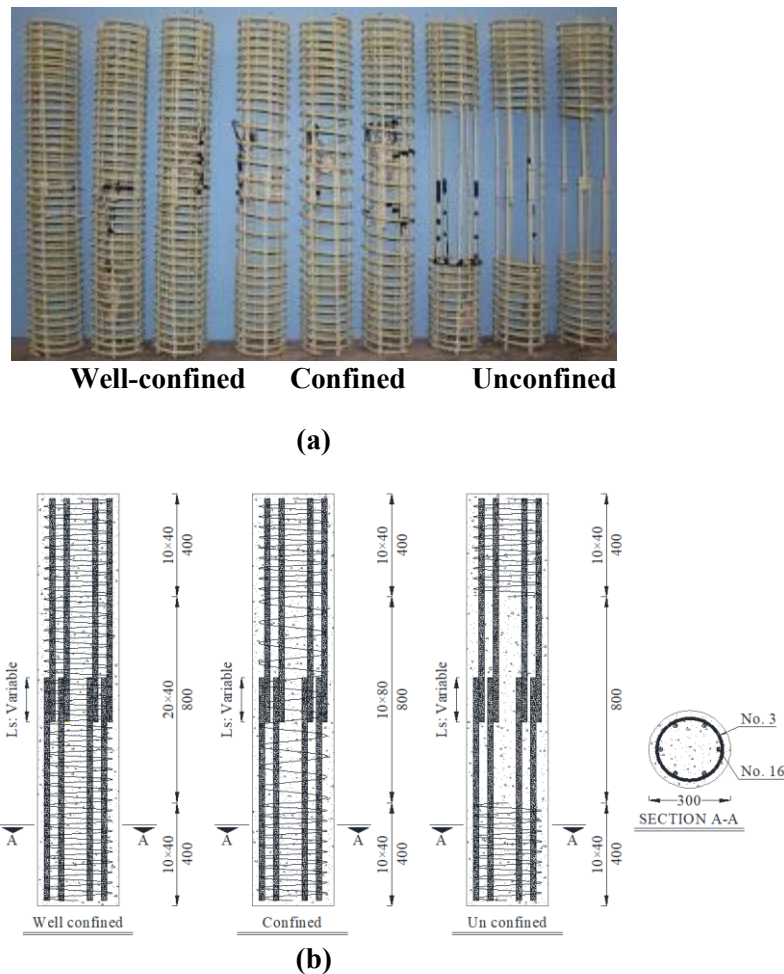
Details of columns: (a) Overview of GFRP cages; (b) dimensions and reinforcement details.
